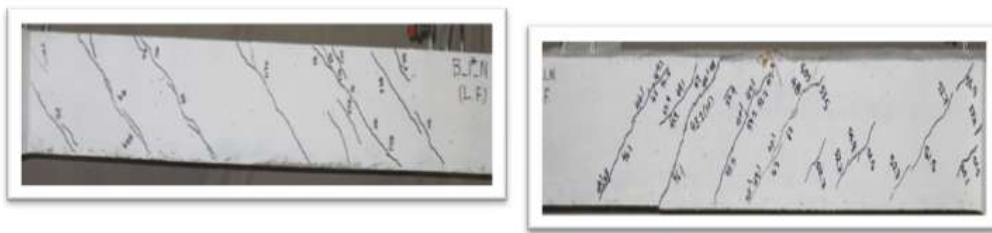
Side view of beam B1N at failure Fig.7. Side view of beam D1N at failure
